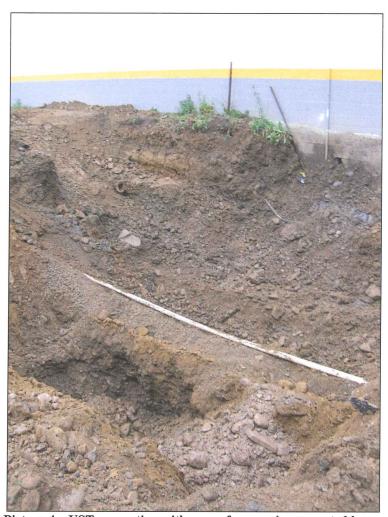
UST excavation with steel pipe supporting sewer force main.
